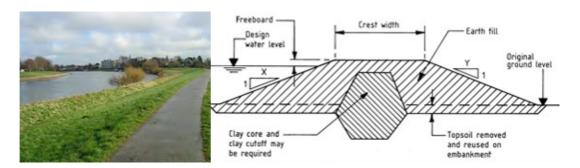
Photo (left) and an indicative design cross section of an earth embankment flood defence (right) (Source: EA FCERM Libraries, 2011)^x.
